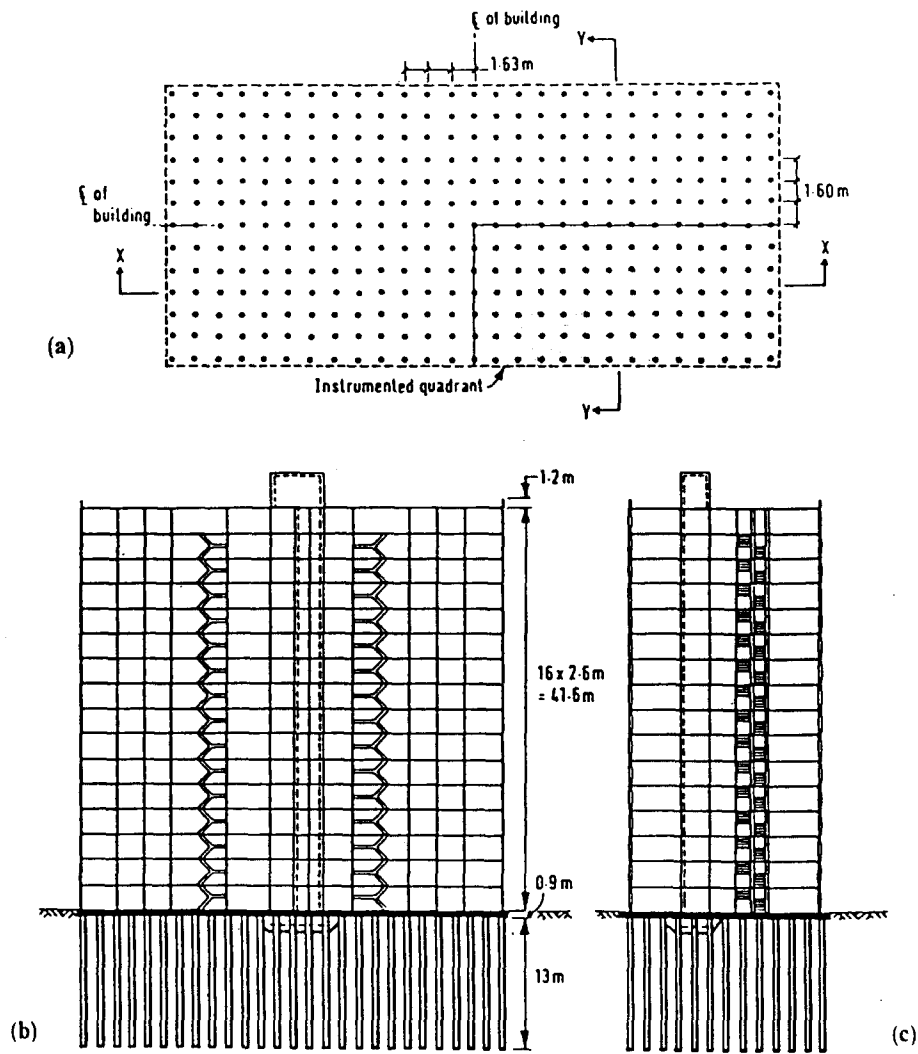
Plan (a) and elevation (b) of Stonebridge Park Flats (Cooke et al, 1981)
